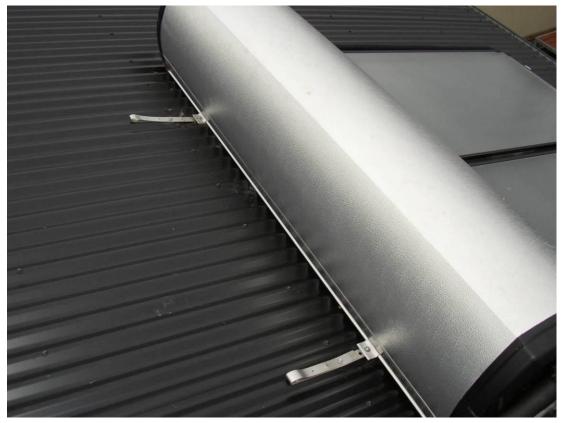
Stainless steel straps with zinc-coated screws used unseparated from a coated zinc-aluminium alloy roof – if the paint coating is broken, corrosion of the roofing will occur.
